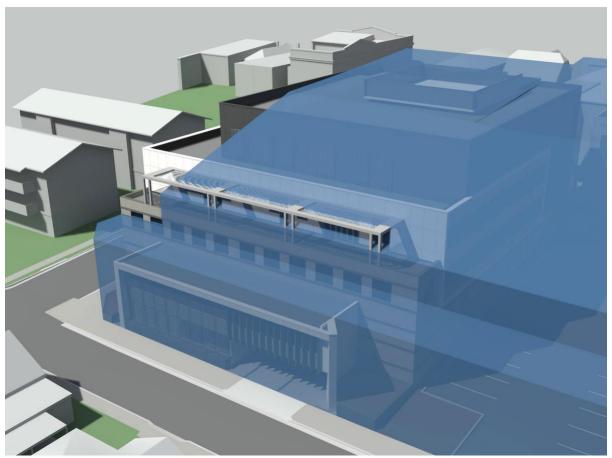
Proposed built form from Date Street in relation to DCP building envelopes
